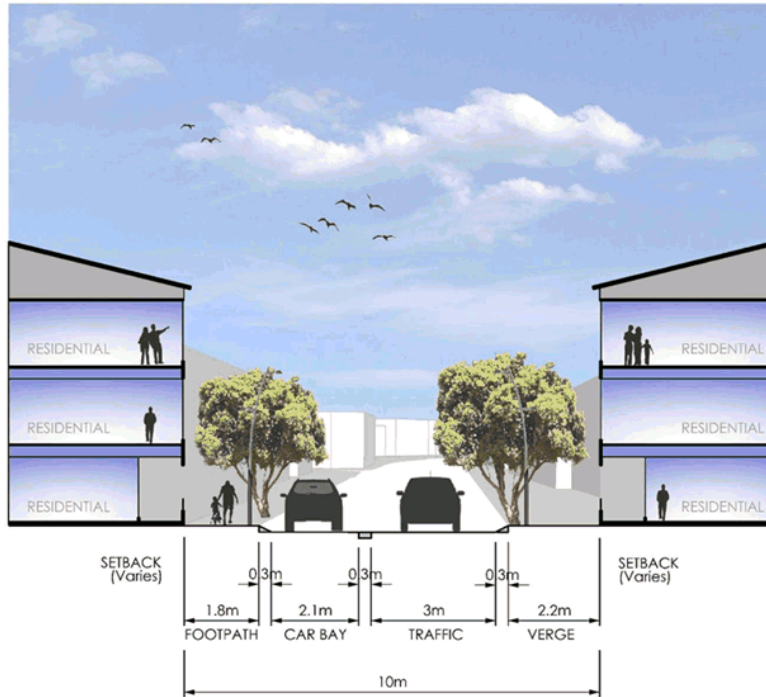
Typical cross-section of Mixed-Residential adjoining road
